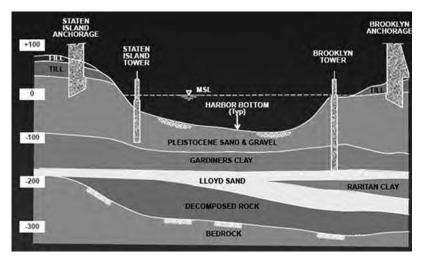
The Narrows Geological Section with the main pillars of the Verrazano-Narrows Bridge close to the proposed storm surge barrier location (adapted from Lacy *et al.*, 2009).
